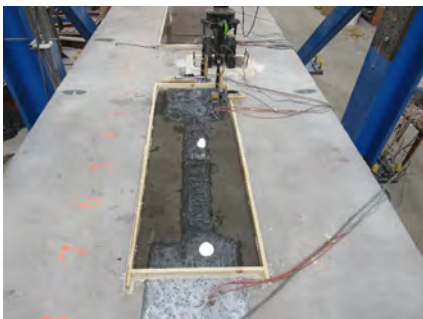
Damage of Continuous Joint of Rehabilitated Double-Tee Bridge Specimen during Fatigue II Testing
